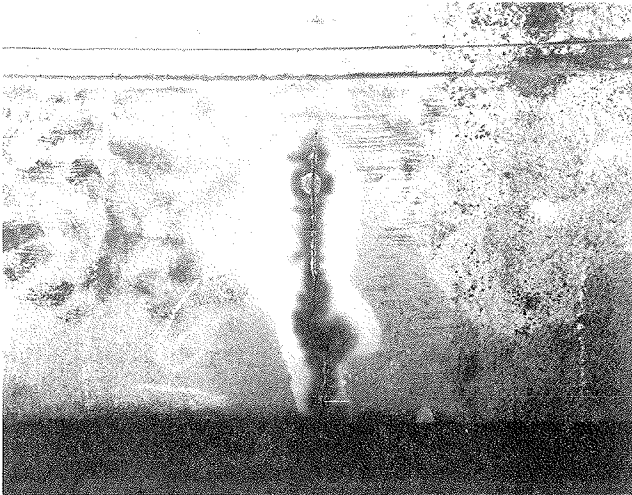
Fatigue crack in deteriorated compression flange of test beam 1.
